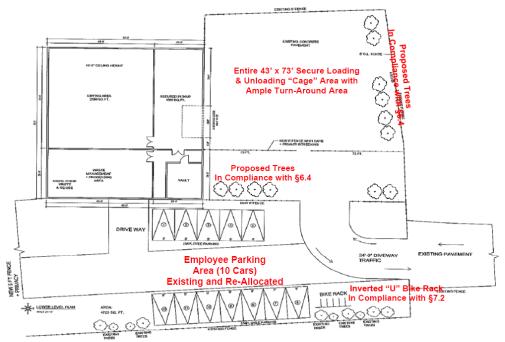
Proposed lower level floor plan and conceptual site plan - Applicant 2022
